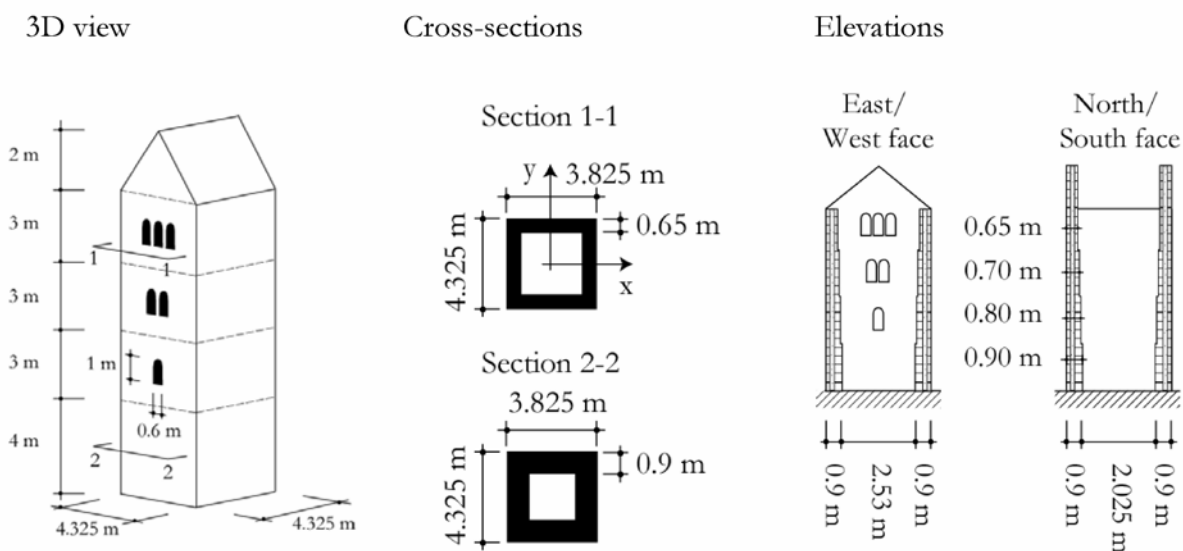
3D view, cross-sections and elevation of the tower.
